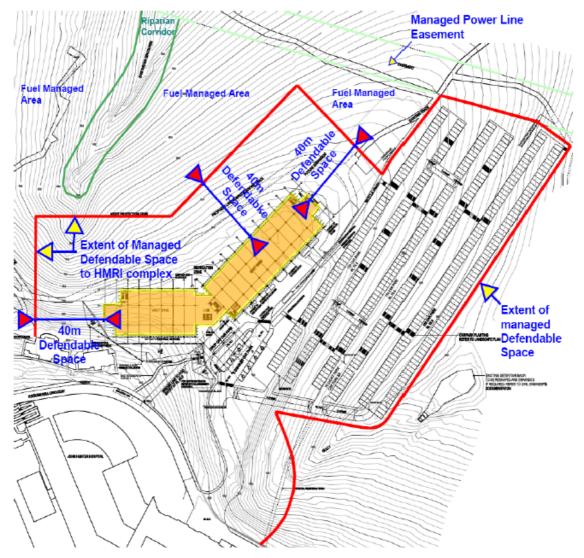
Extract Plan of Defendable Spaces (Inner Protection Zones) and Fuel Managed Areas (Outer Protection Zones per ABPP Bushfire Protection Assessment for the Construction of the HMRI Building per ABPP Assessment Report No. B08900 dated 18/08/2009.
